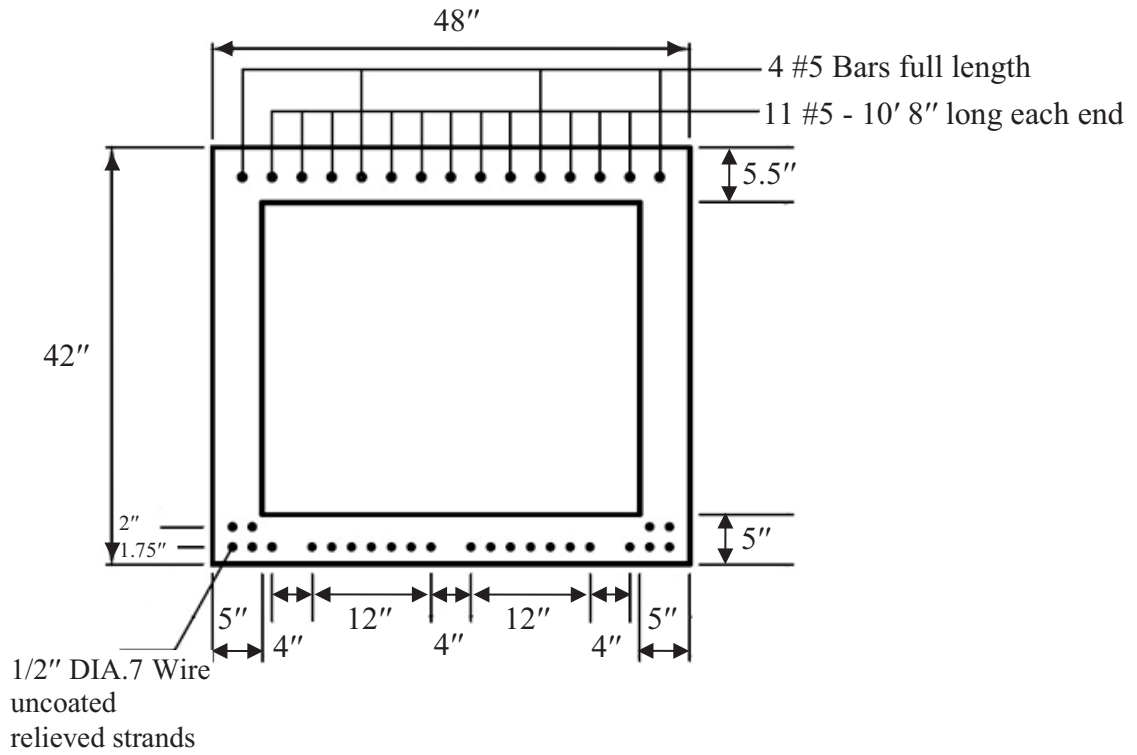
Typical transverse section of Ashtabula Bridge.
